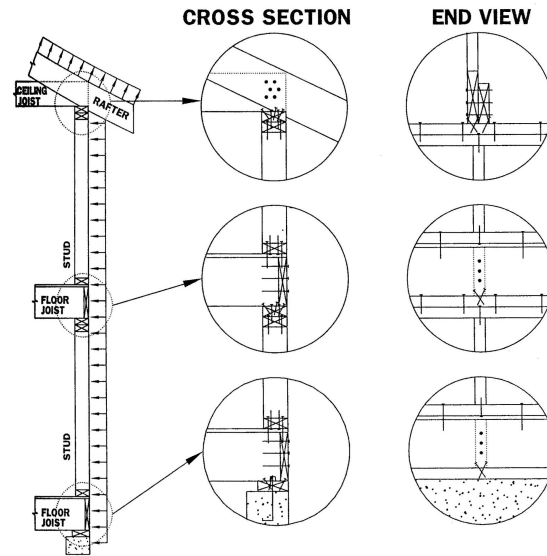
Typical lateral framing connections (Source: AF&PA 2001)
